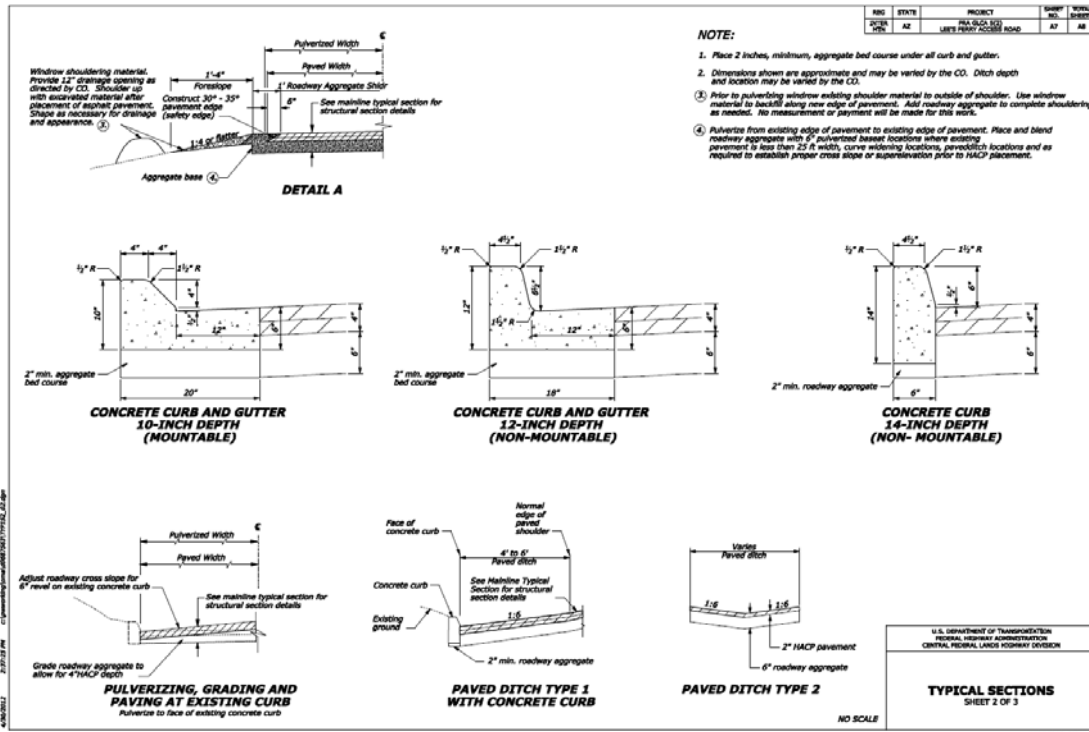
Paved Ditch and Curb and Gutter BMP Installation
